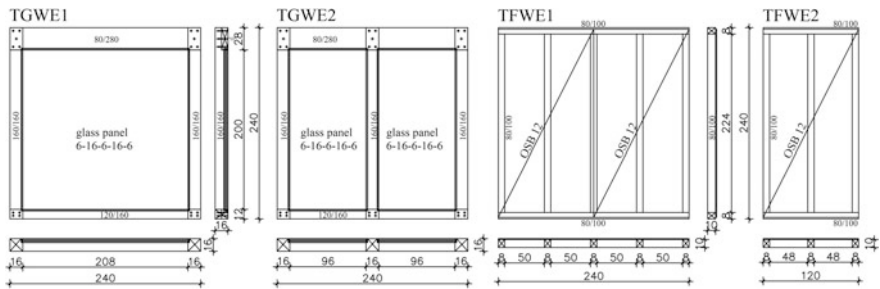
Dimensions of timber-glass and light timber-framed wall elements [111]
